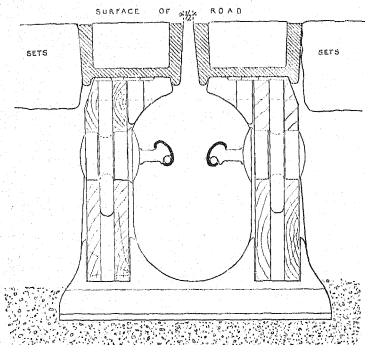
Transverse Section of Conduit of Electric Tramway System
